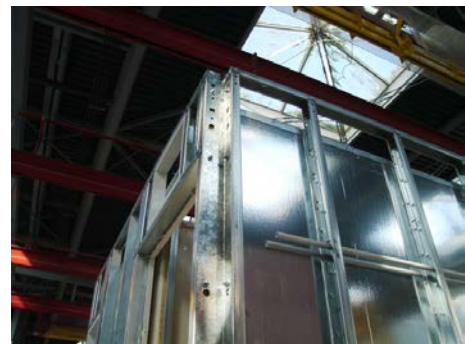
(left): Wall panel being lifted to be fitted to the floor panel
